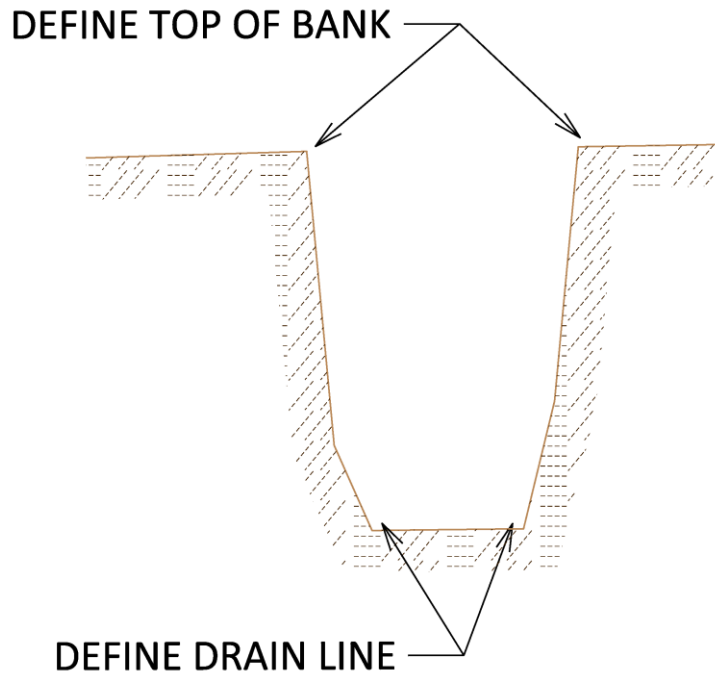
OUTFALL DRAINAGE SURVEY DETAIL – CROSS SECTION
